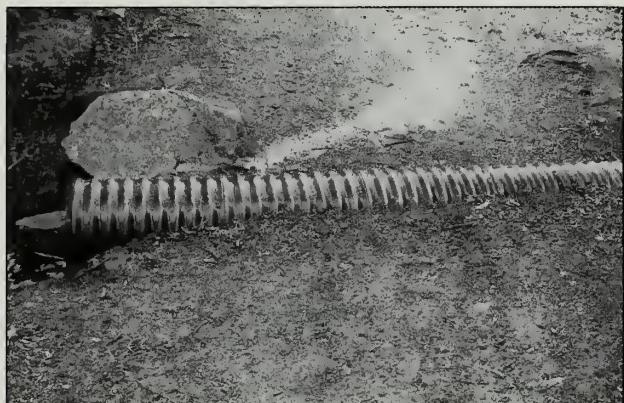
This 10-foot-long corrugated pipe culvert, installed by Mission 66 crews on the Beech Mountain Loop Trail (#113), has been exposed by frost heave and tread loss.
